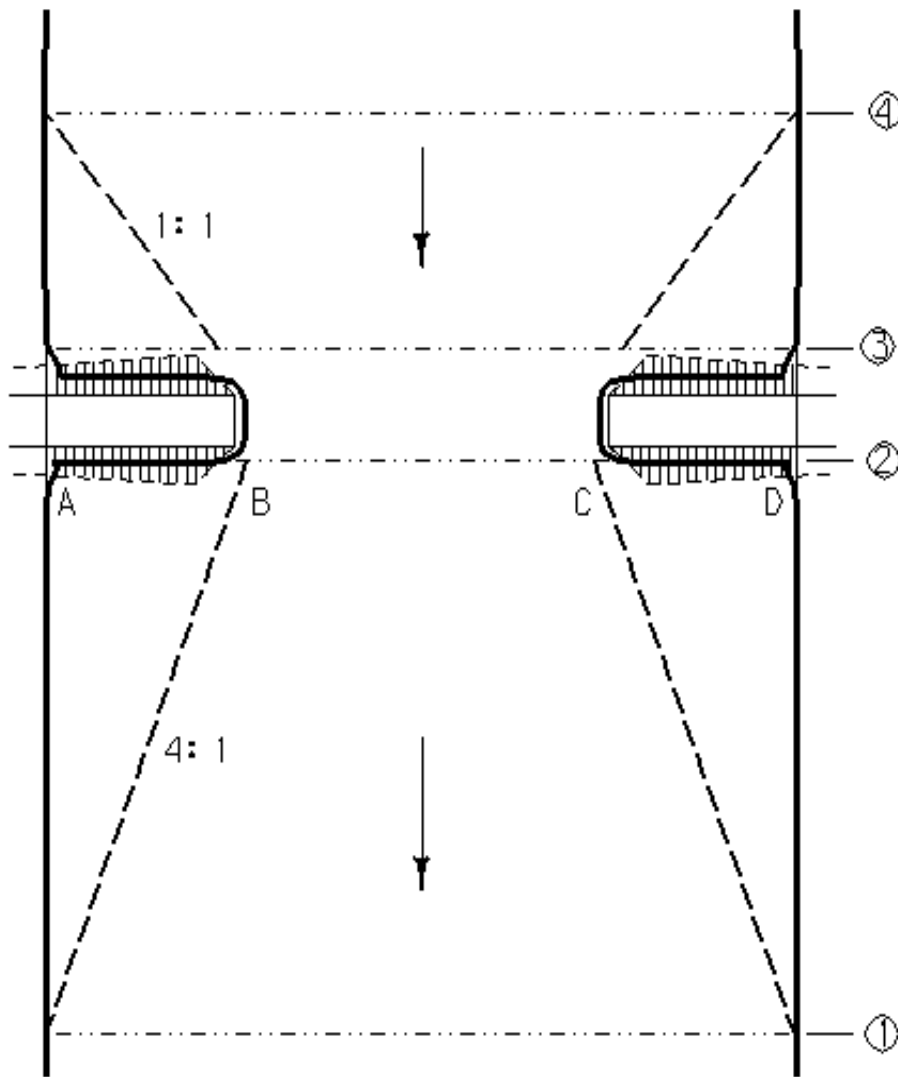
Cross-Section Locations In The Vicinity of Bridges
